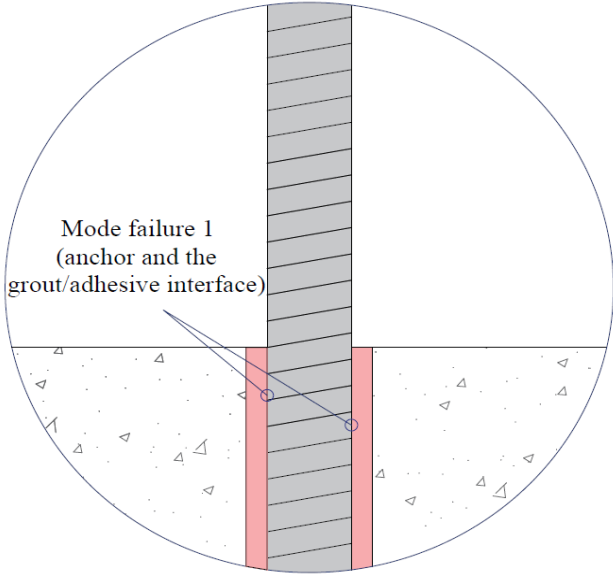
4 Mode failure I between anchor and the adhesive/grout
